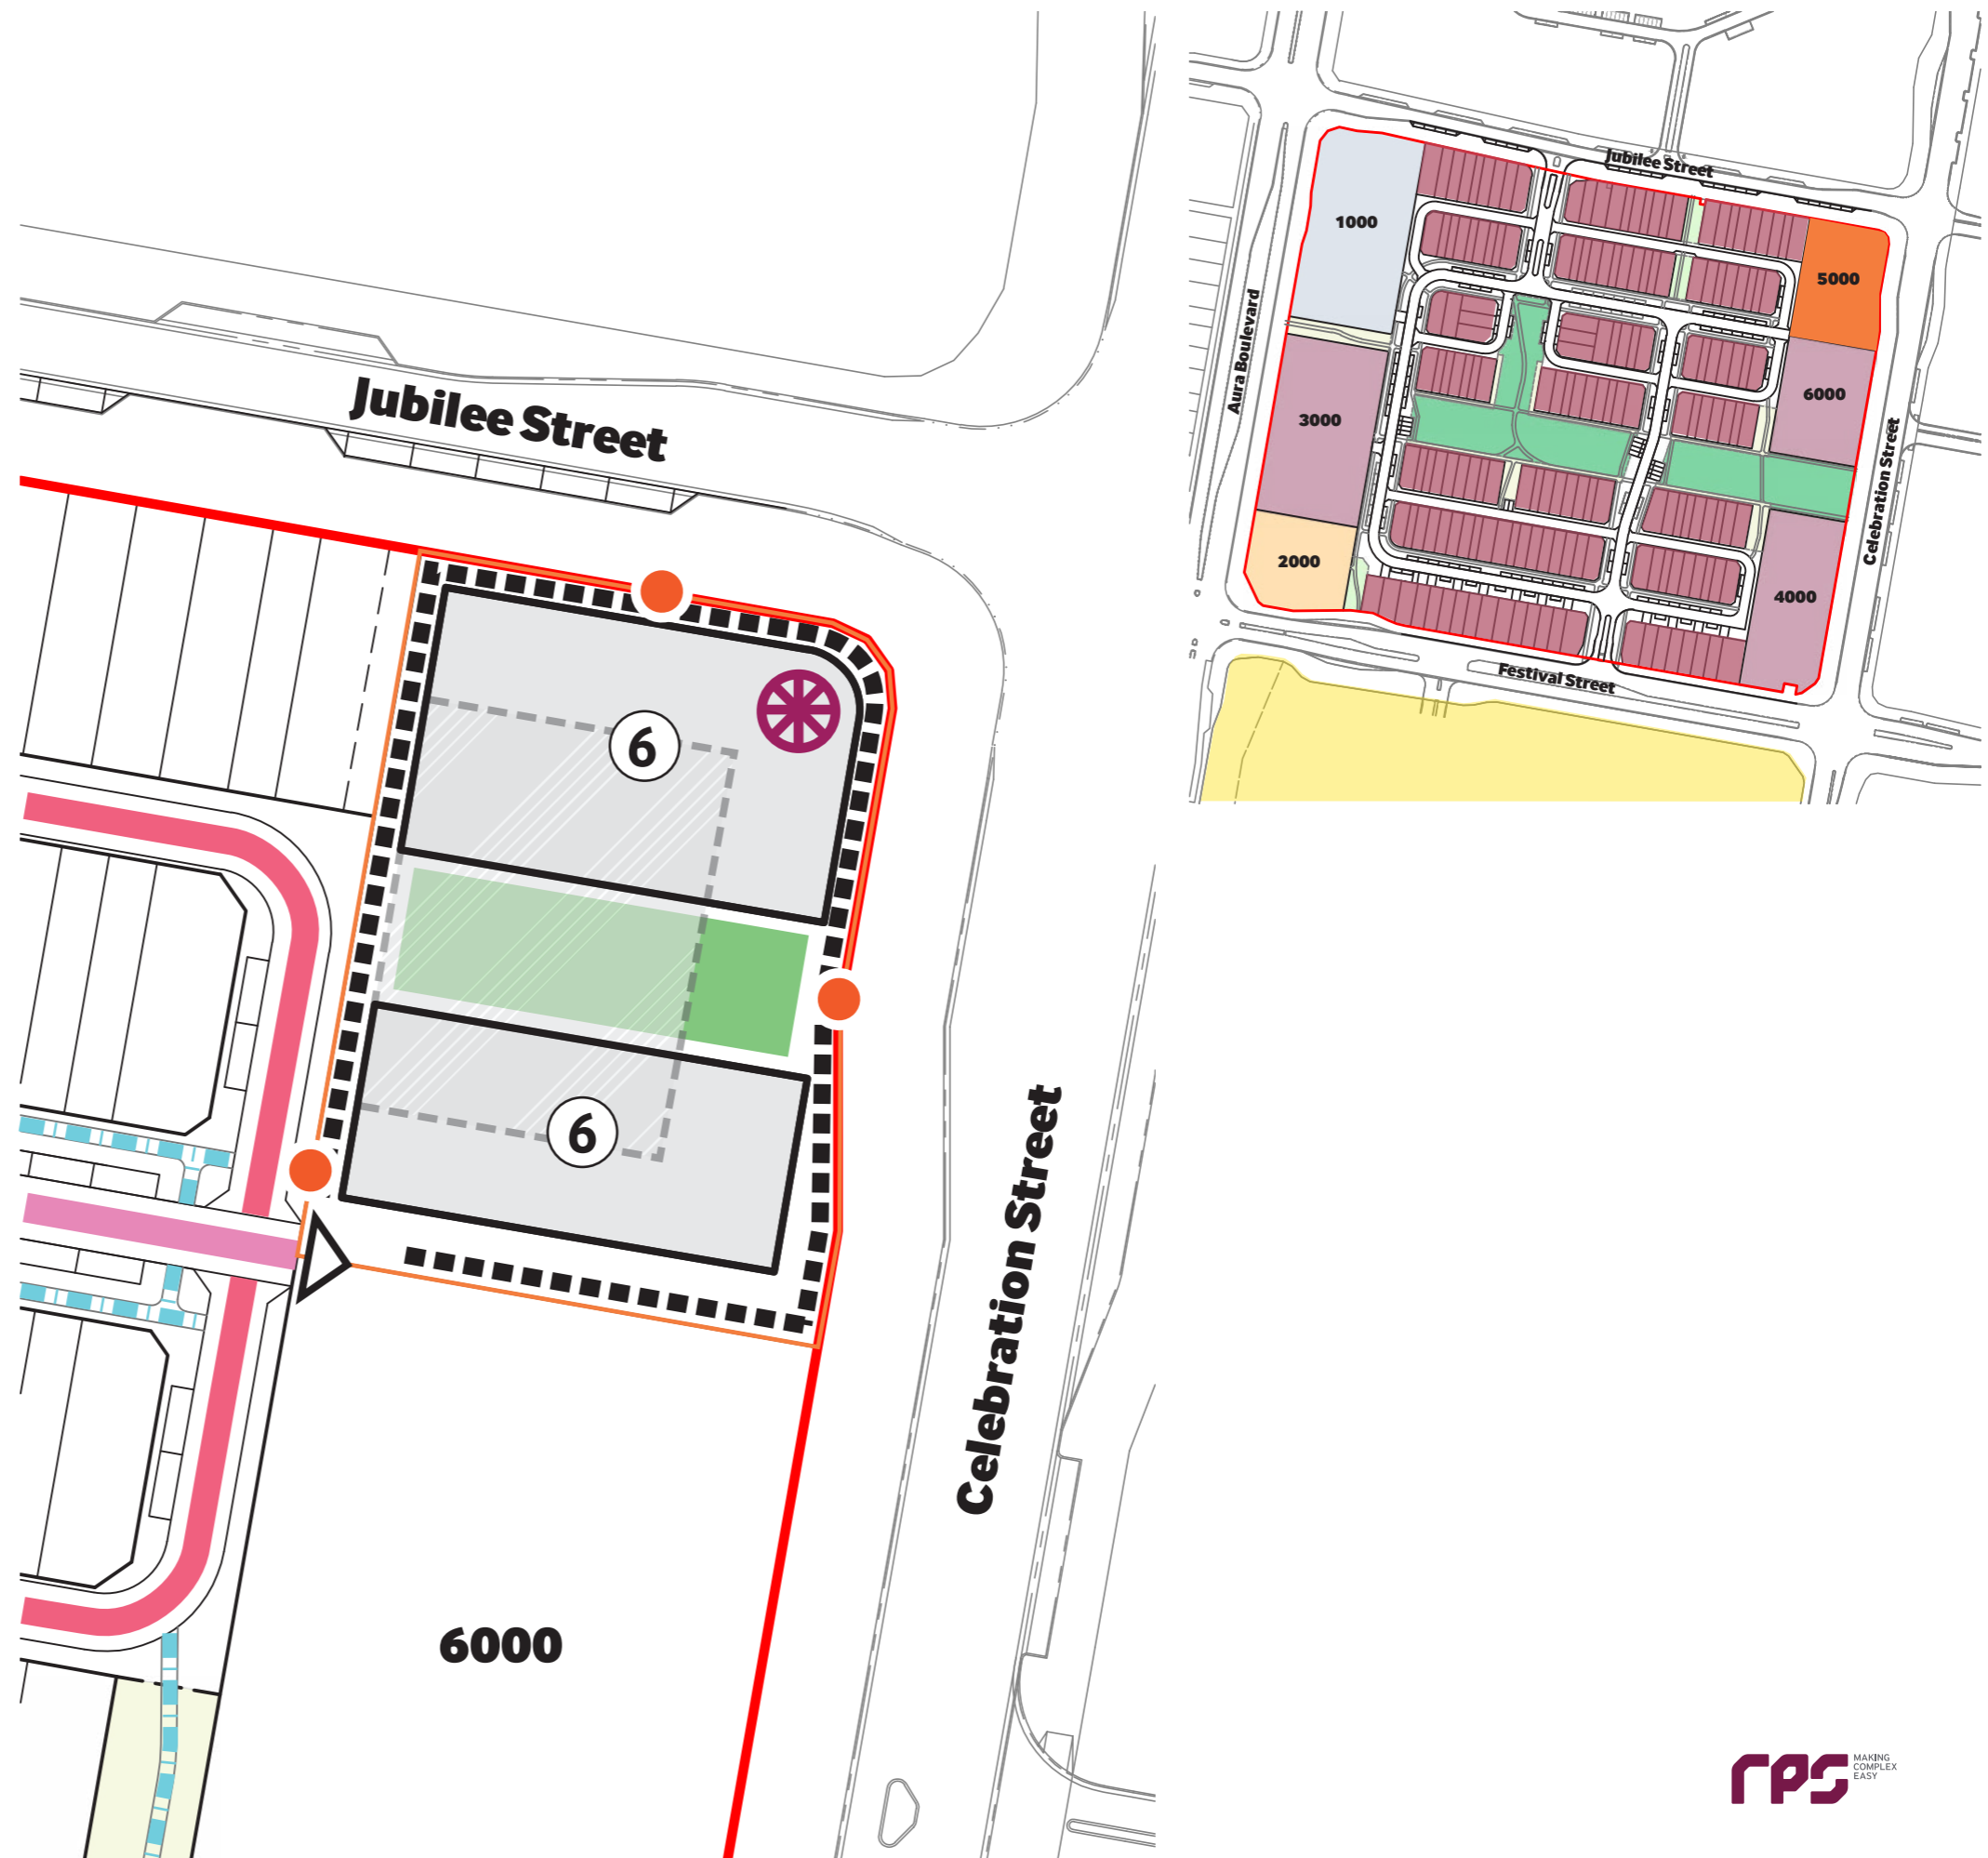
SUB-PRECINCT 9.1B - PLAN OF DEVELOPMENT
